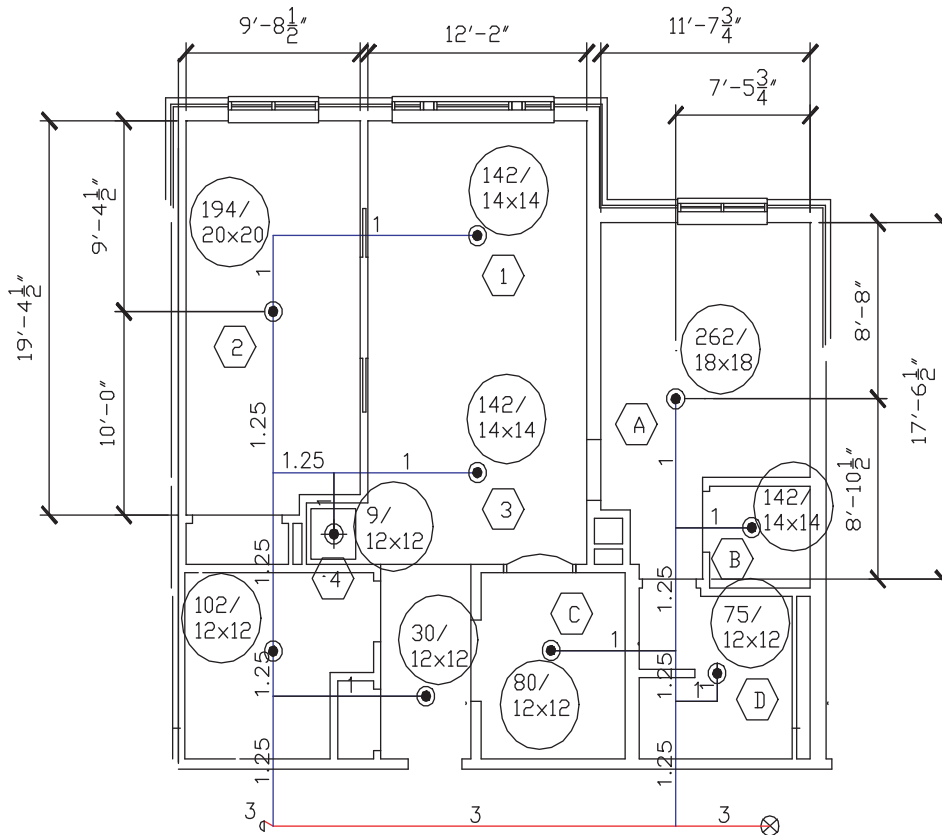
Typical NFPA 13 Application of Residential Sprinklers
